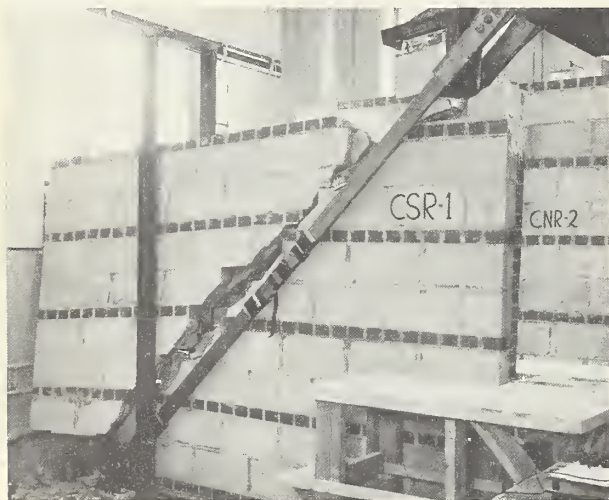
Shear failure in block backing of composite masonry wall CS-1.
